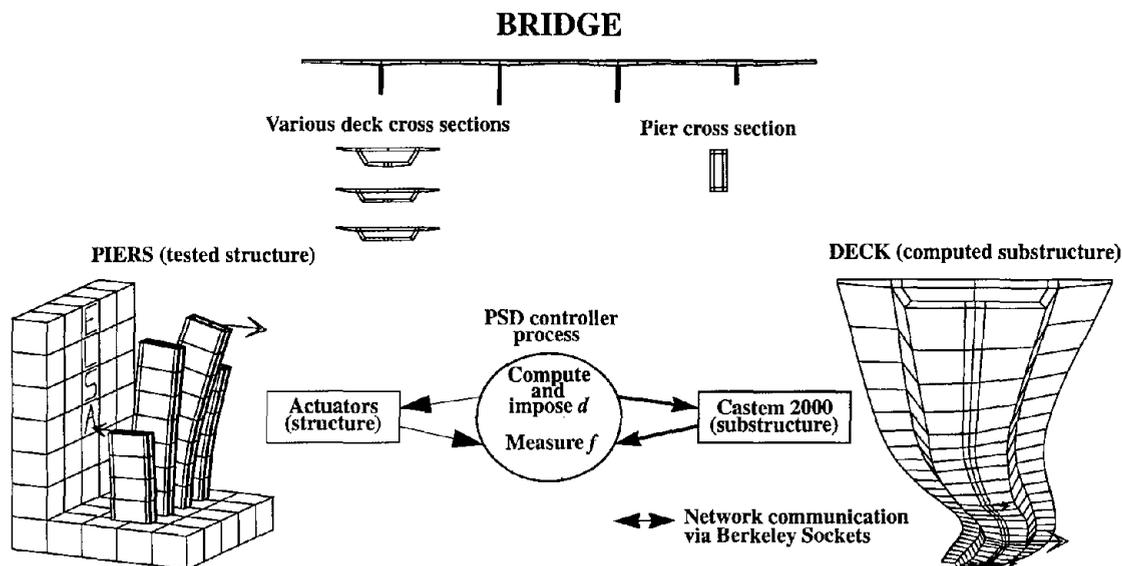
Pseudo-dynamic testing with substructuring: a four piers bridge case.
